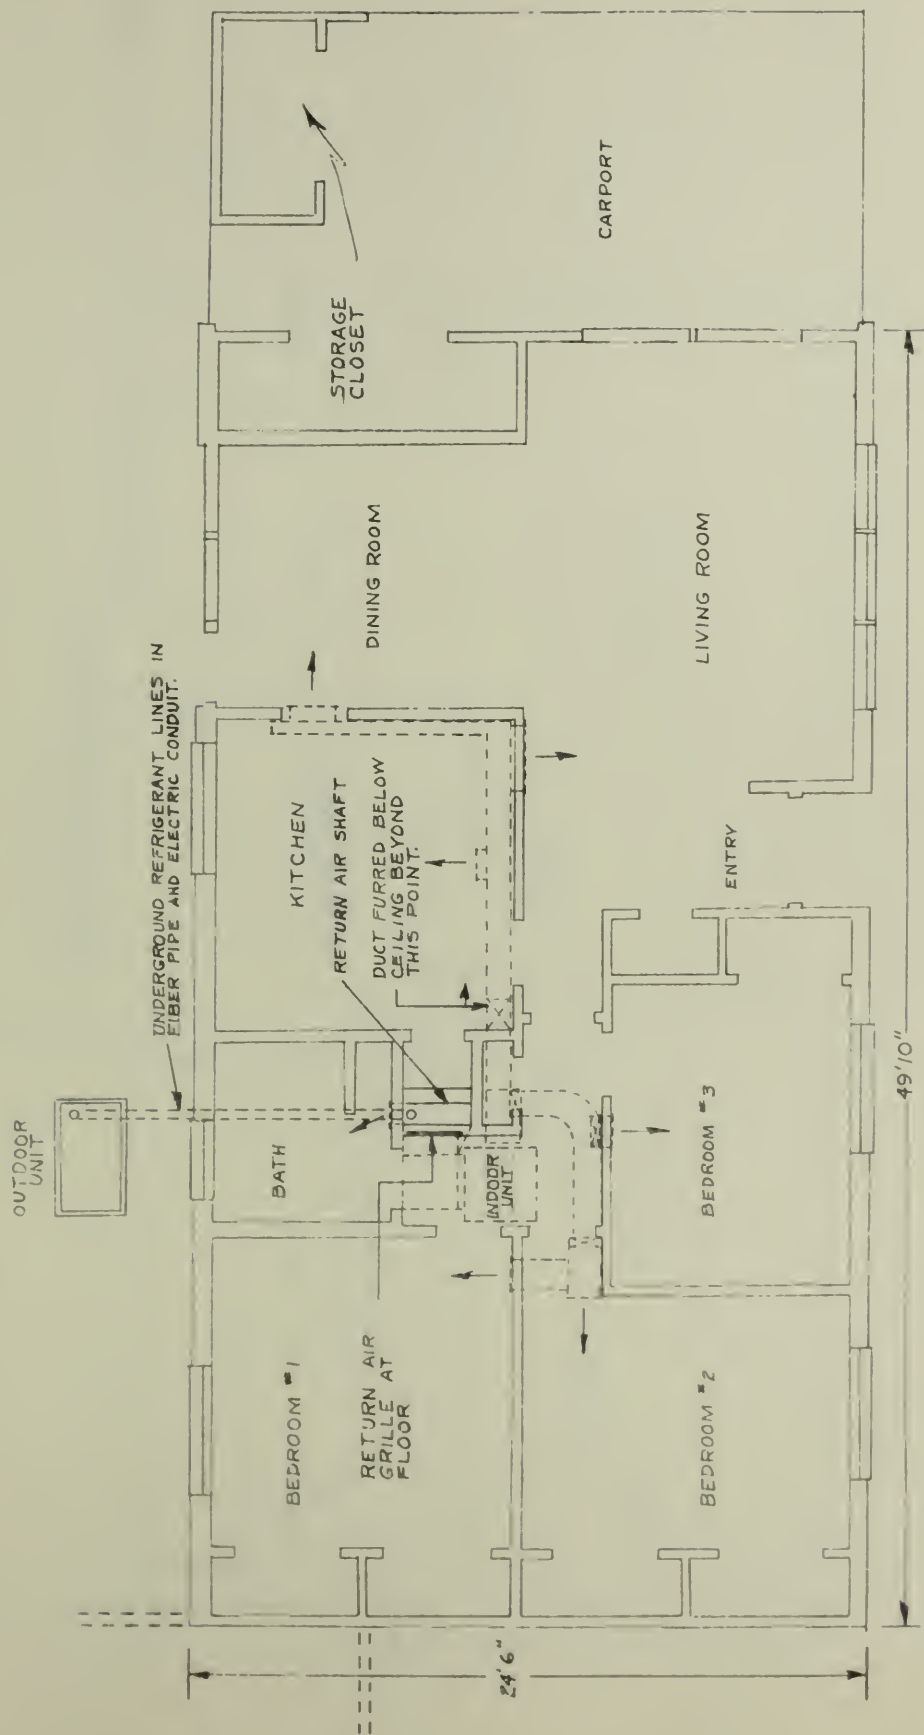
Plan View of Type B House, Seymour Johnson Air Force Base
